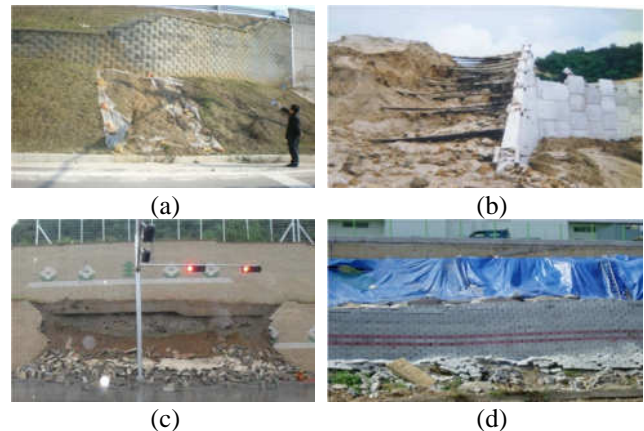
Failure case history of other reinforced earth wall((a) loss of bottom front banking soil of REW due to poor drainage system in the backfilling area, (b) loss of backfilled soil due to improper construction of backfill area and lack of drainage system, (c) collapse boundary area between cutting area and banking area due to not sufficient drainage system and lack of soil compaction, (d) pull-out failure of reinforcement due to improper soil compaction and lack of pull-out capacity)(Lee et. al., 2011)
